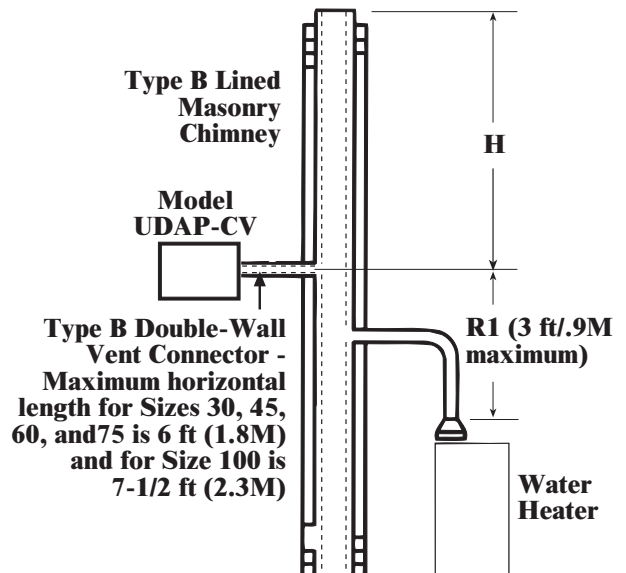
B - Typical Common Vent Application of a unit heater and a water heater venting into a double-wall Type B lined Masonry Chimney
